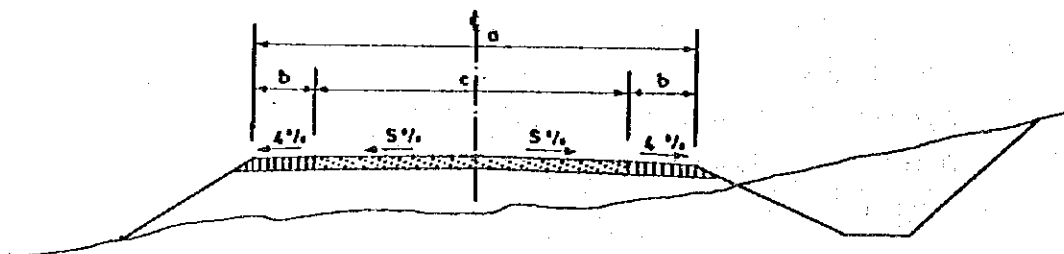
Cross Section Type II-VIII- Single Carriage Way
